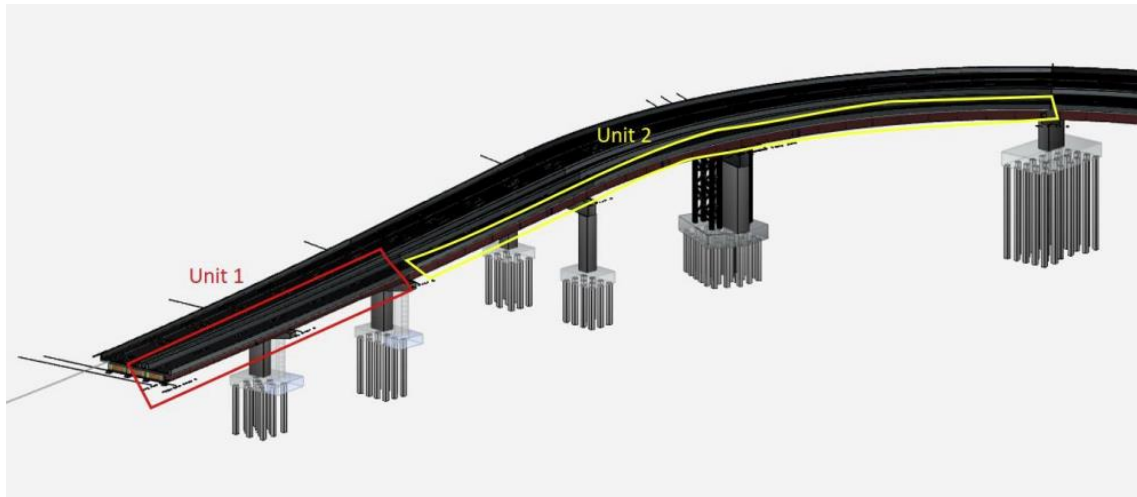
Proposed structures to be constructed/deconstructed, OpenBrIM Platform 3D model
